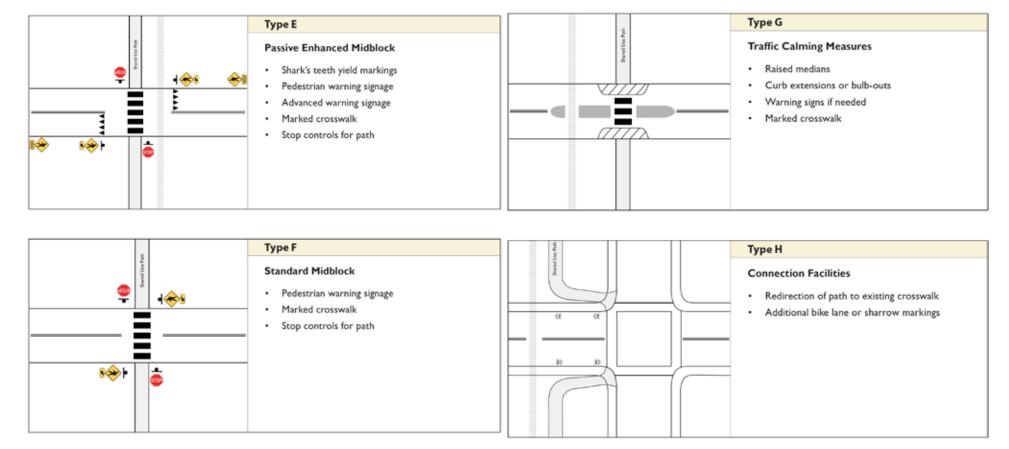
Detailed Roadway Crossing Concepts, Types E, F, G and H
